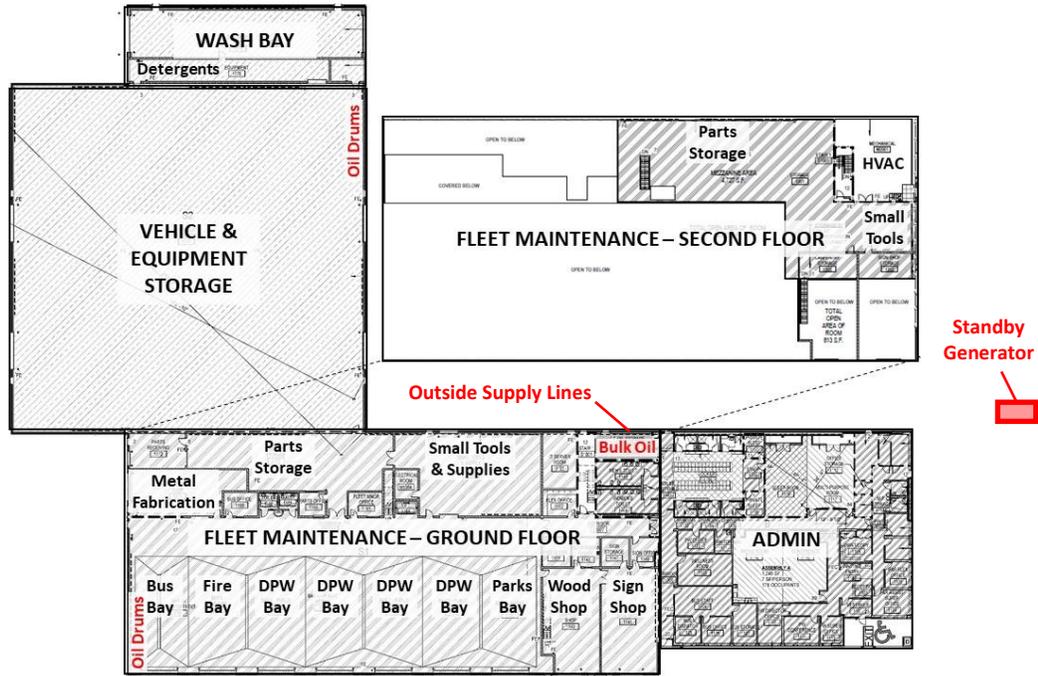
Main Building Floor Plan (oil / lubricant storage locations in red)
